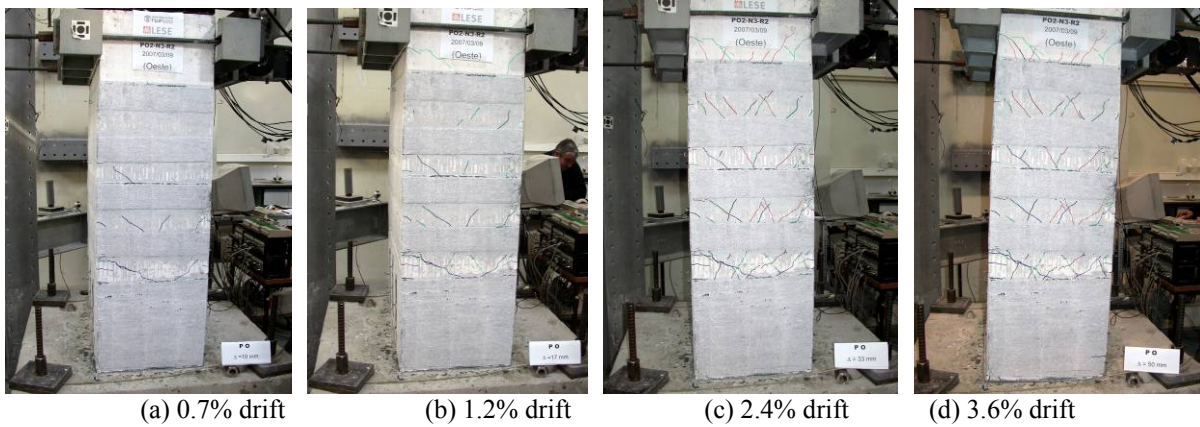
Retrofitted pier PO2 damage from west side view.
